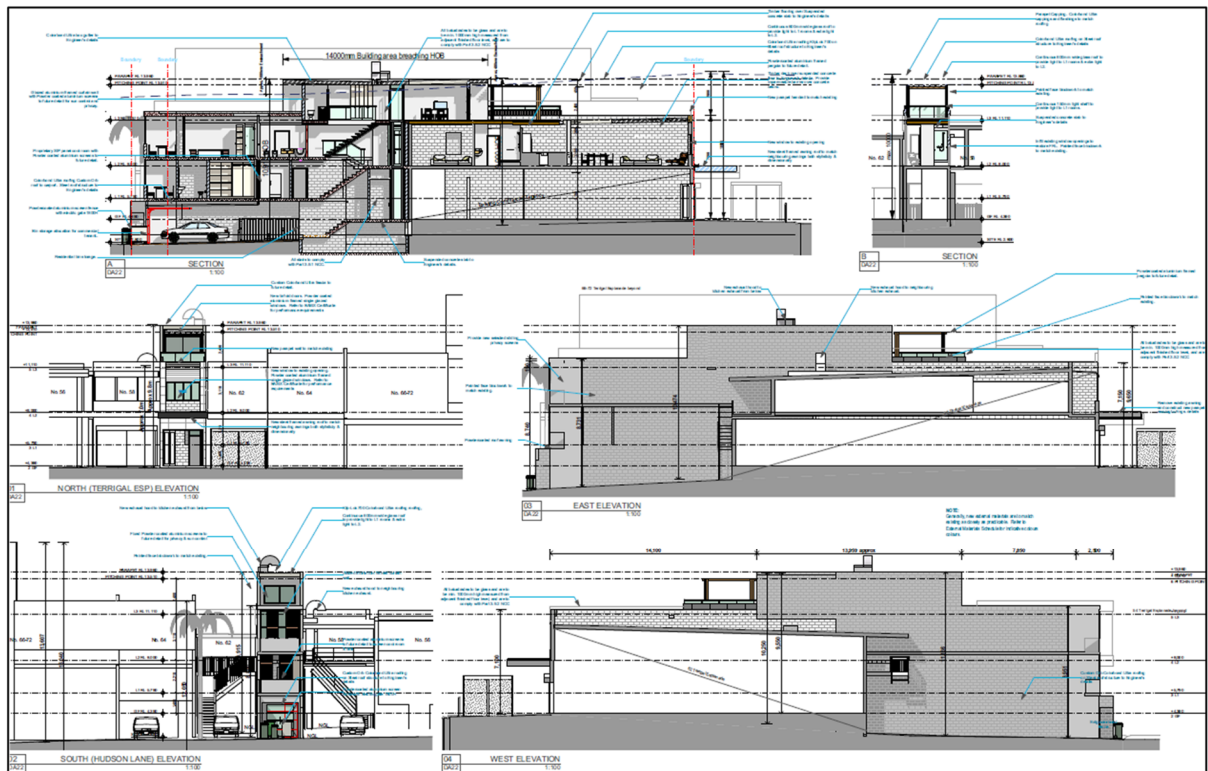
Proposals Architectural Elevations and Sections (not to scale)
